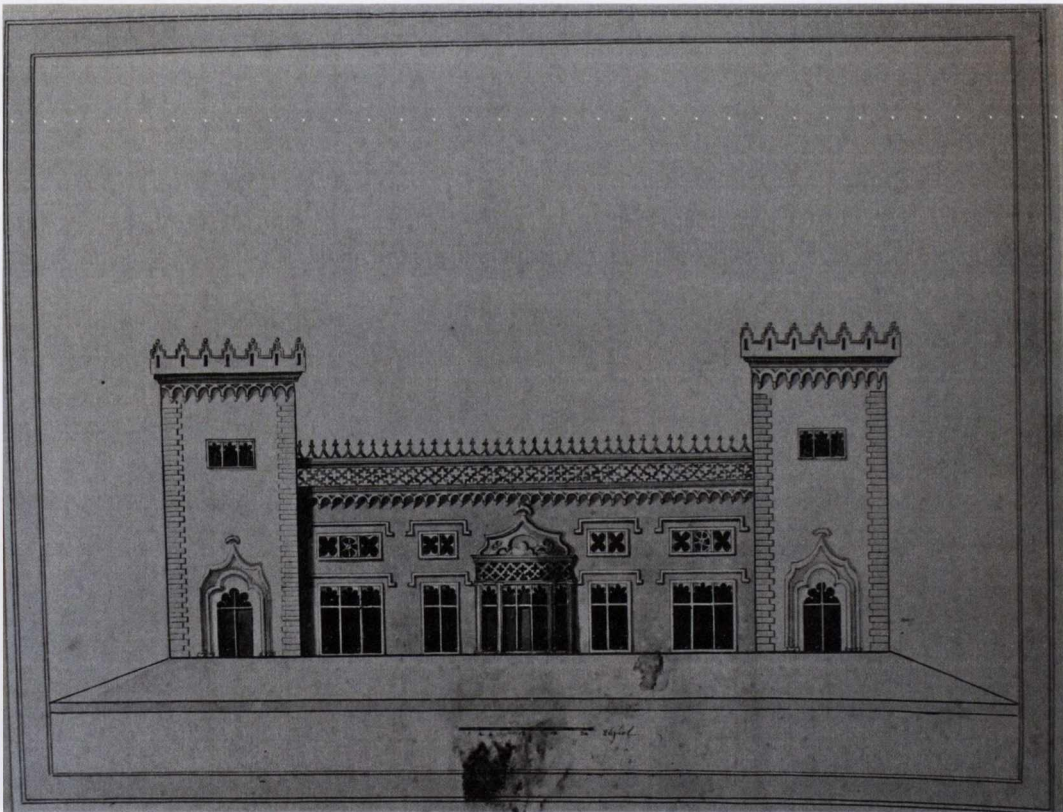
Proposed scheme for Charleville Castle, south elevation, attrib. to C.W. Bury, [1797], photograph IAA, A/6/10, courtesy of the Irish Architectural Archive.
